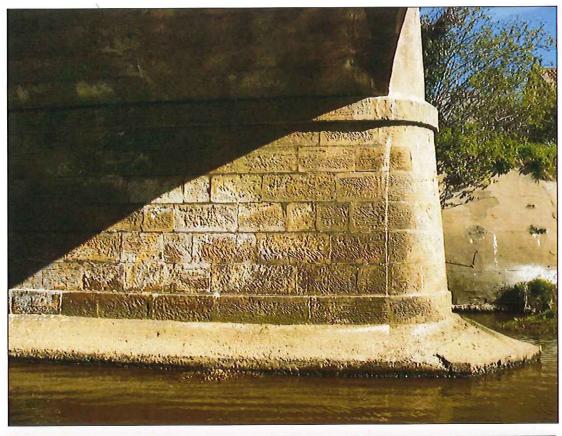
Concrete widening #4 to eastern downstream side of south span. Note circumferential cracking.
